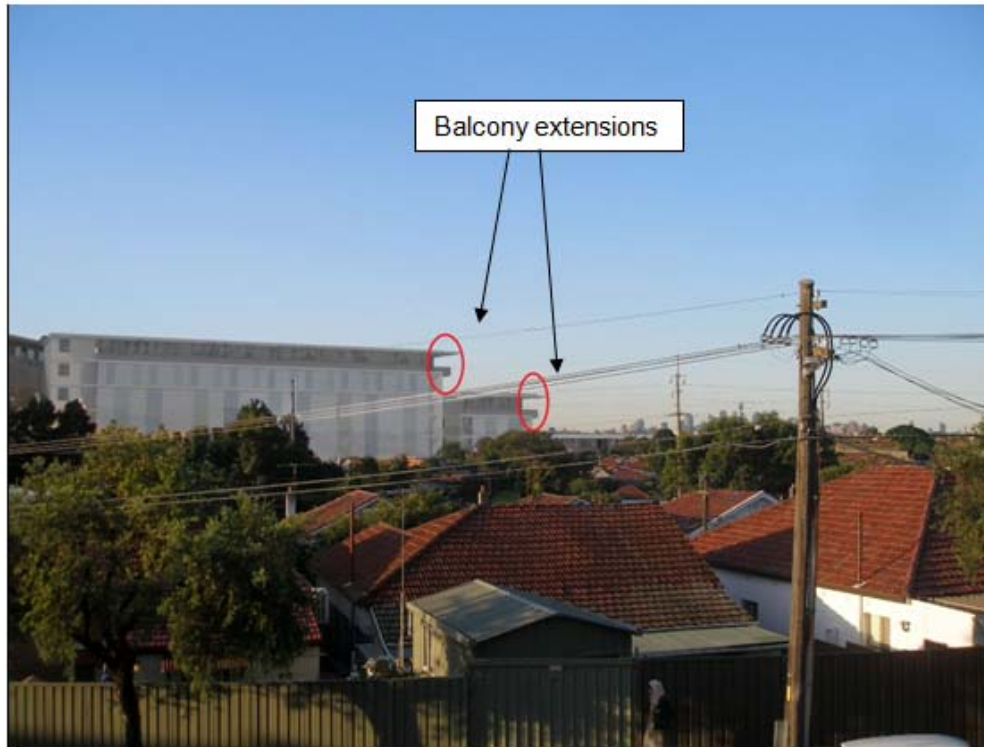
View montage from balcony of Unit 2/8-10 Schwebel Street, Marrickville of the proposed modified development
